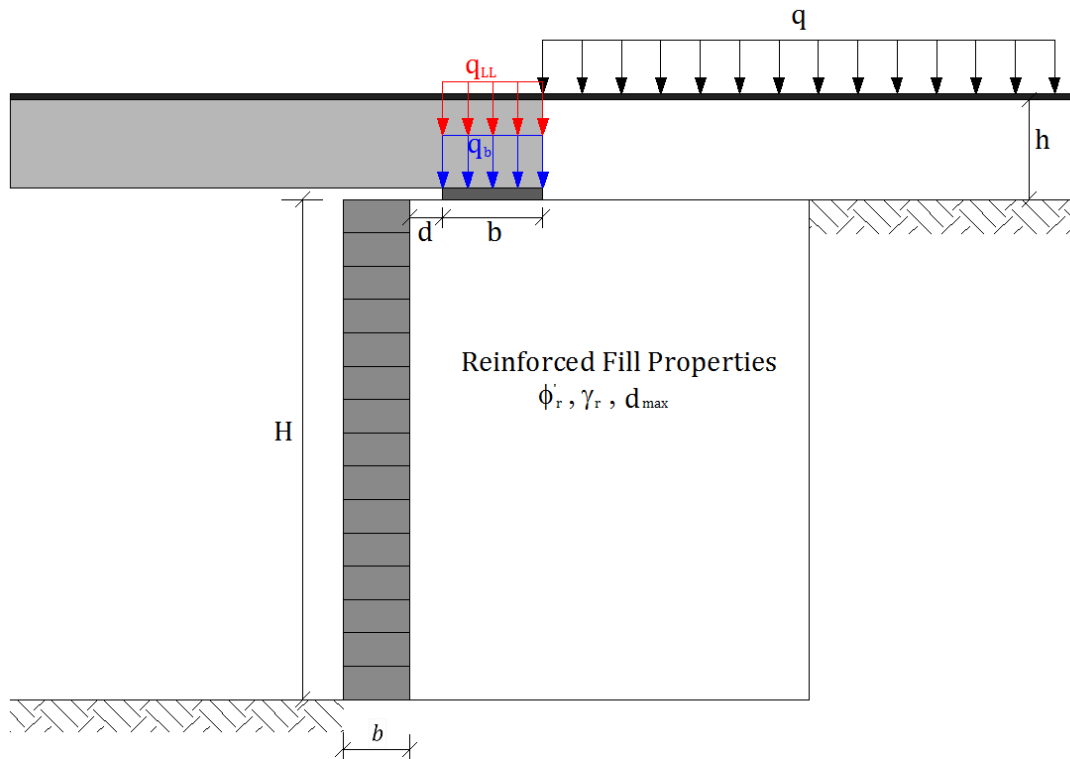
Base Case Abutment Wall for Bridge Loading Condition
